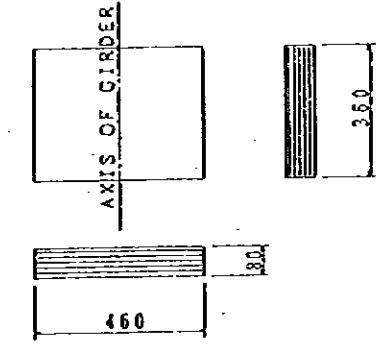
DETAIL OF SHOE AND ANCHOR BAR AT A-LINE
